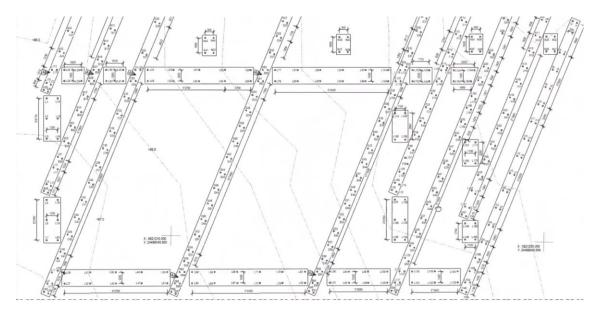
Plan view of the new foundations and intersecting tack beams at the time of relocation
